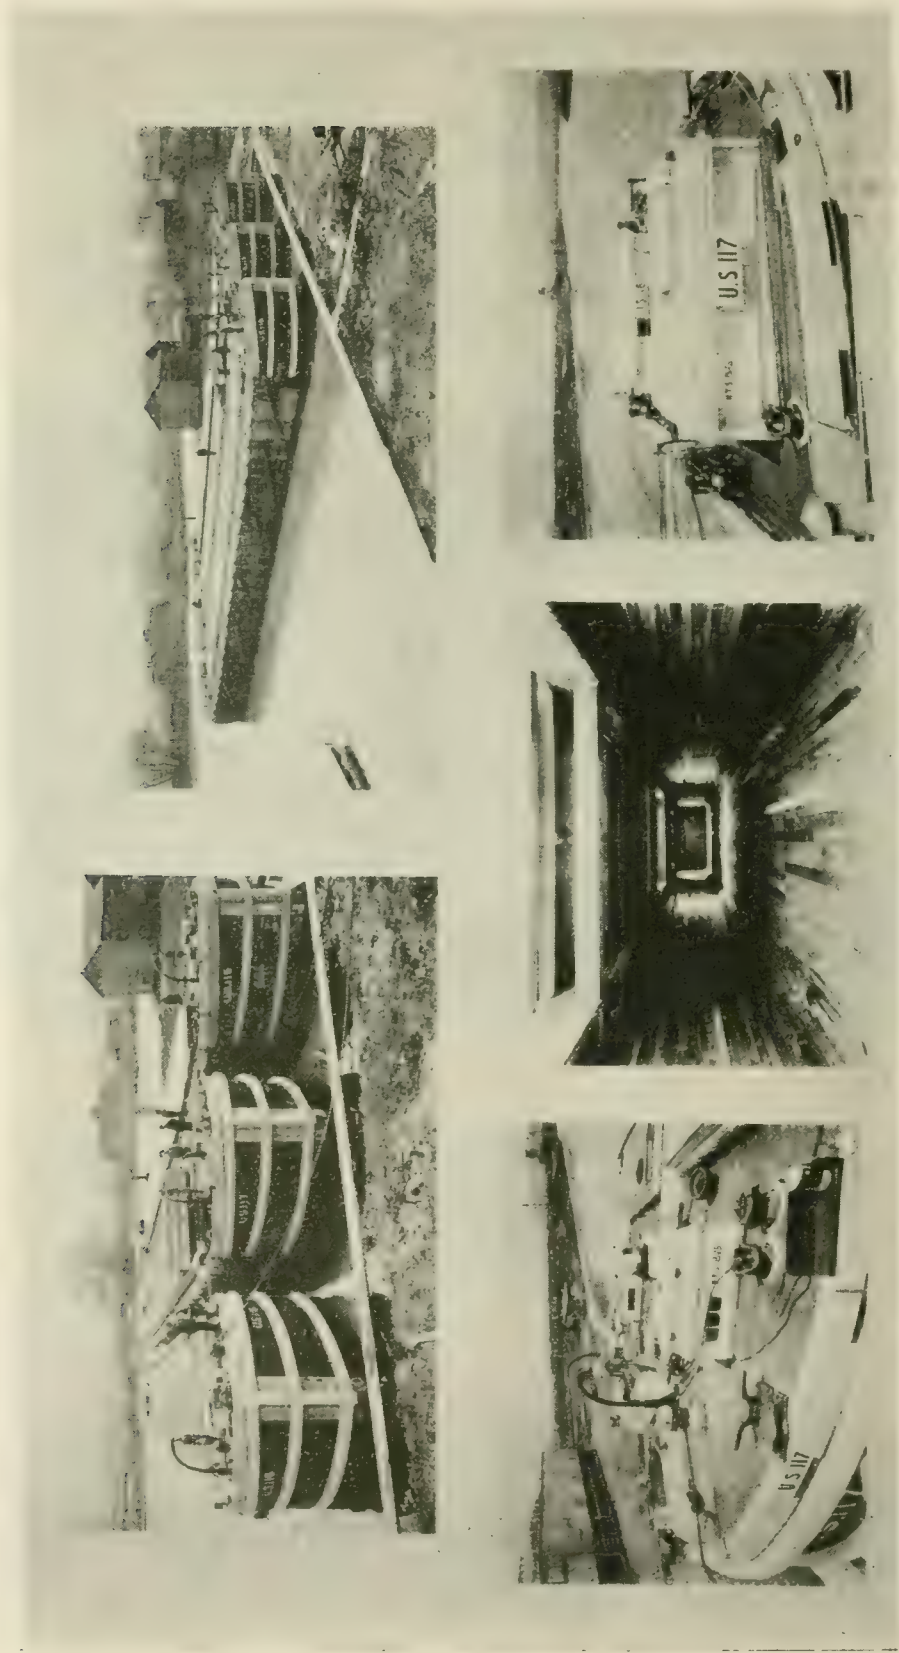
SOME VIEWS OF THE FINISHED CONCRETE BARGES FOR NEW YORK CANALS, ITHACA YARD.
